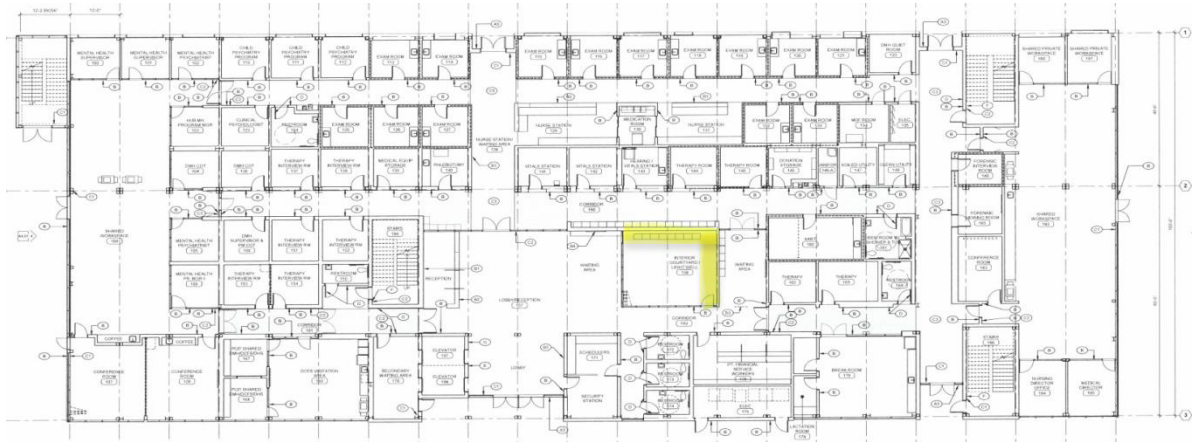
First floor overhead plan showing location of the artwork placement on the interior courtyard/ lightwell walls.
